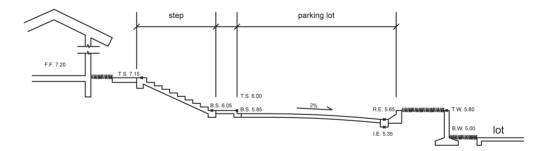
The cross section showing how to specify the slope as % or spot elevation of a walk, walkway edges, and drainage direction.
